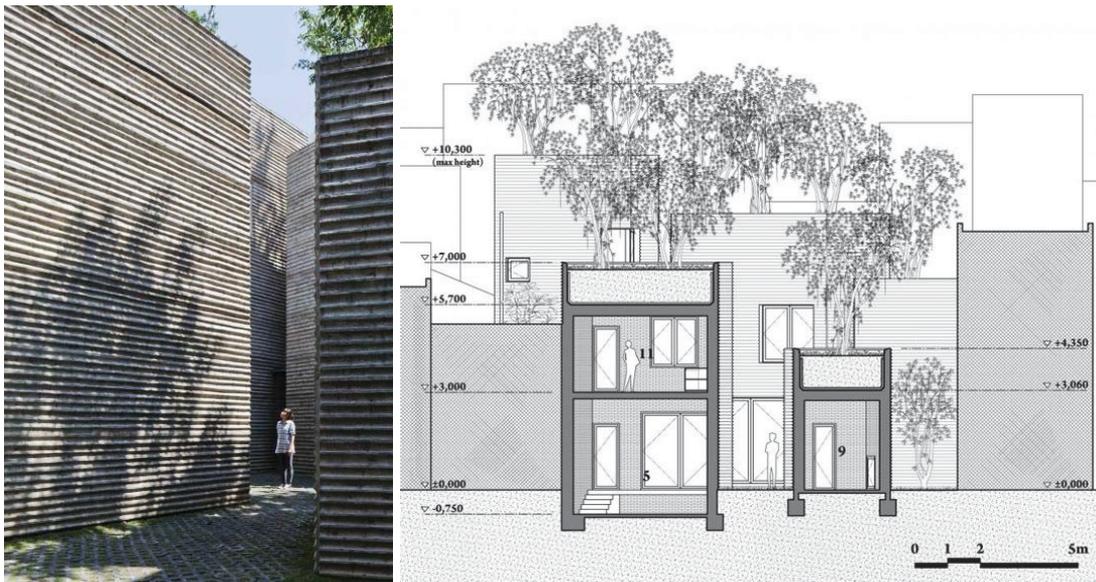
Culm Formwork Cast Concrete Fig 4.46. Excess Rain Water Conduit to Trees from Other Buildings
